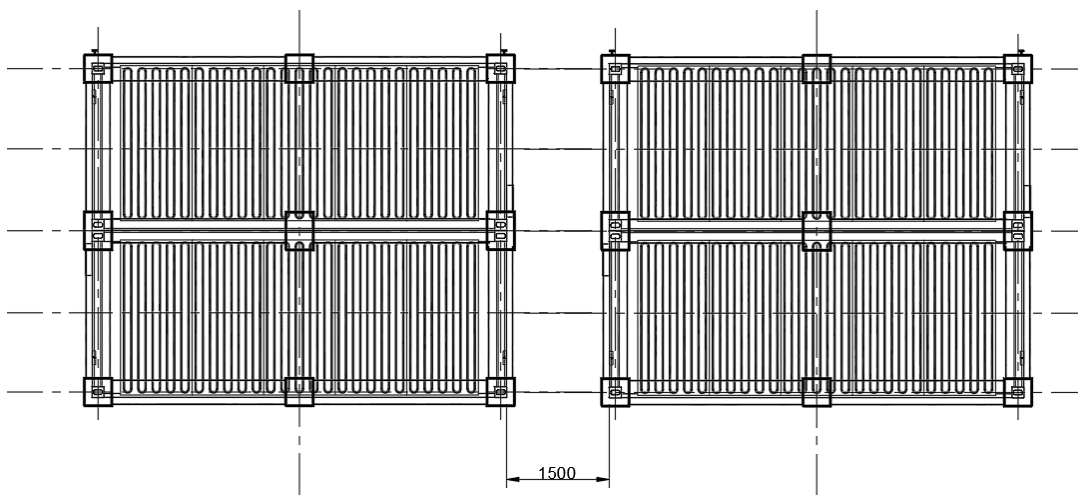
Single SolBank Installation does not require the Bridge Lock hardware. Refer to details for site specific design by EOR.
